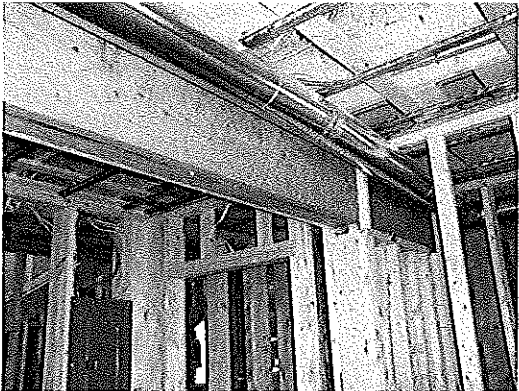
VLAM sister added @ 1<sup>st</sup> floor beam
